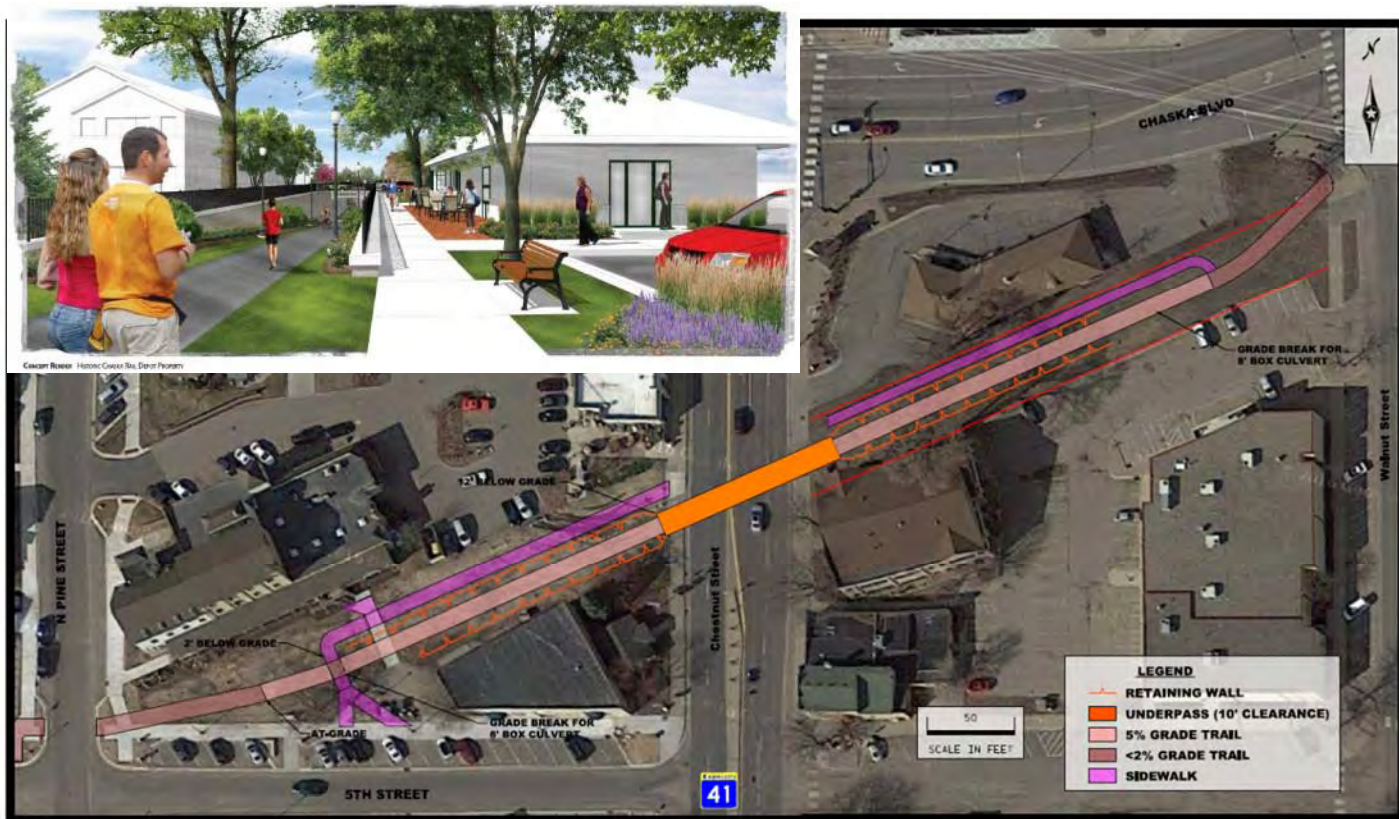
Proposed Pedestrian Underpass South of the CSAH 61/TH 41 Intersection.
